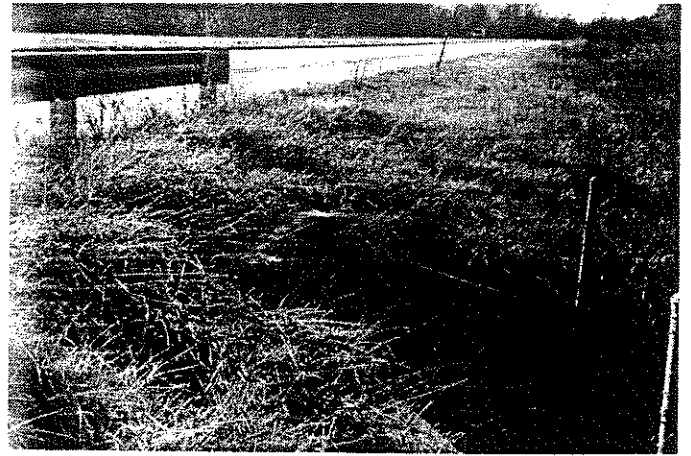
Short section of guardrail at hazardous culvert headwall.
